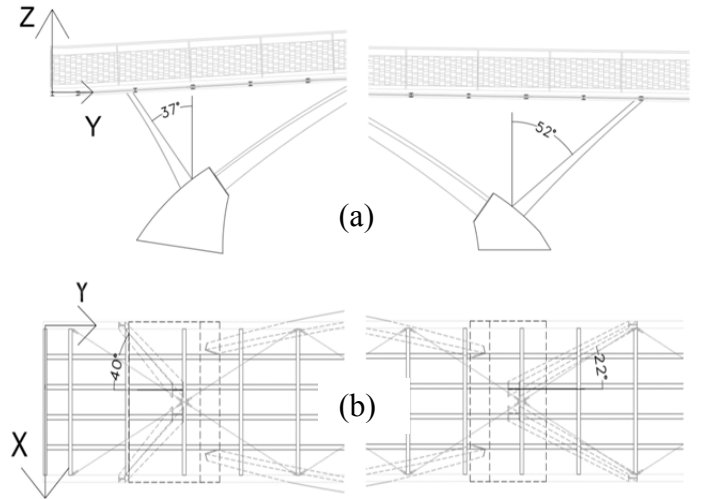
Details of struts inclinations: (a) lateral view; (b) in-plane view.
